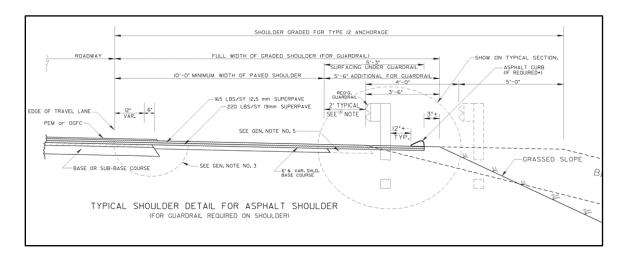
GDOT Drawing Detail S-4-2002 [2]
